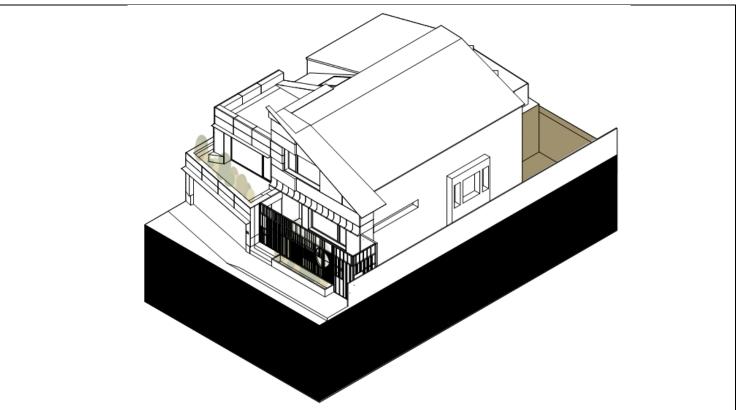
Figure C (above): Proposed stone cladding, new coping and high front boundary treatment
